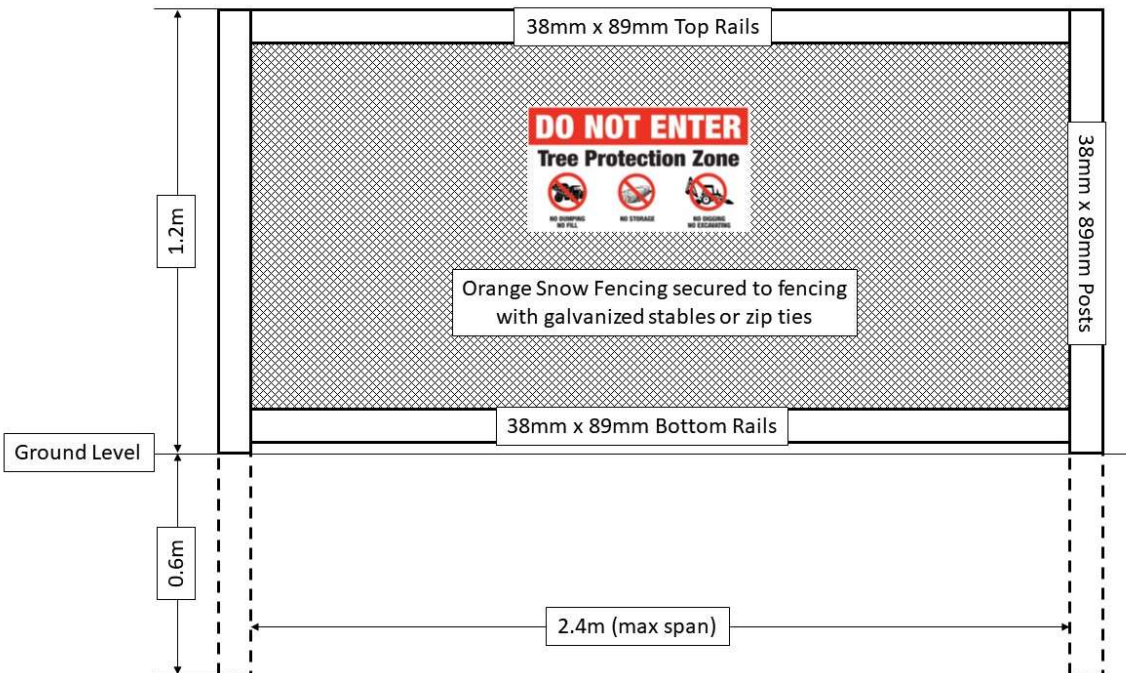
Tree Protection Fencing. In rocky areas, metal (t-posts or rebar) drilled into rick will be accepted instead of wooden posts.
